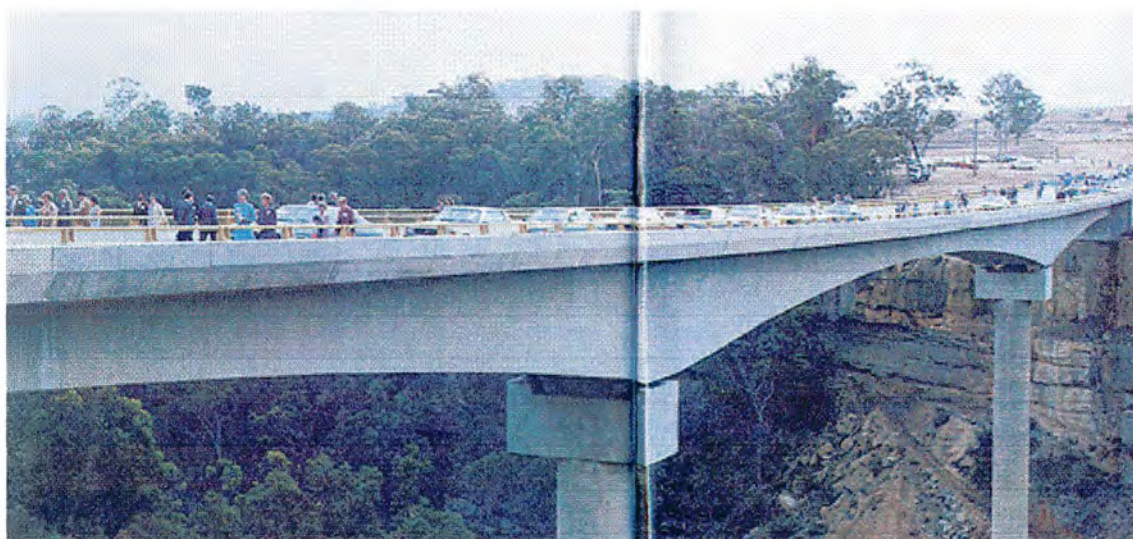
The 1980 prestressed concrete, bridge downstream of the old suspension bridge.
